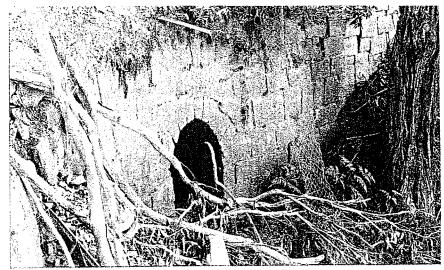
Culvert outlet with arched voussoir stones, set in curved retaining wall; 13.9 km north of Mt Manning junction (1830-31)
